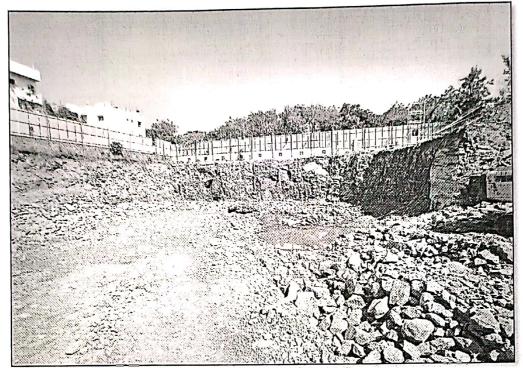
students watching ongoing construction activities and understanding site layout, plan for execution of project.
